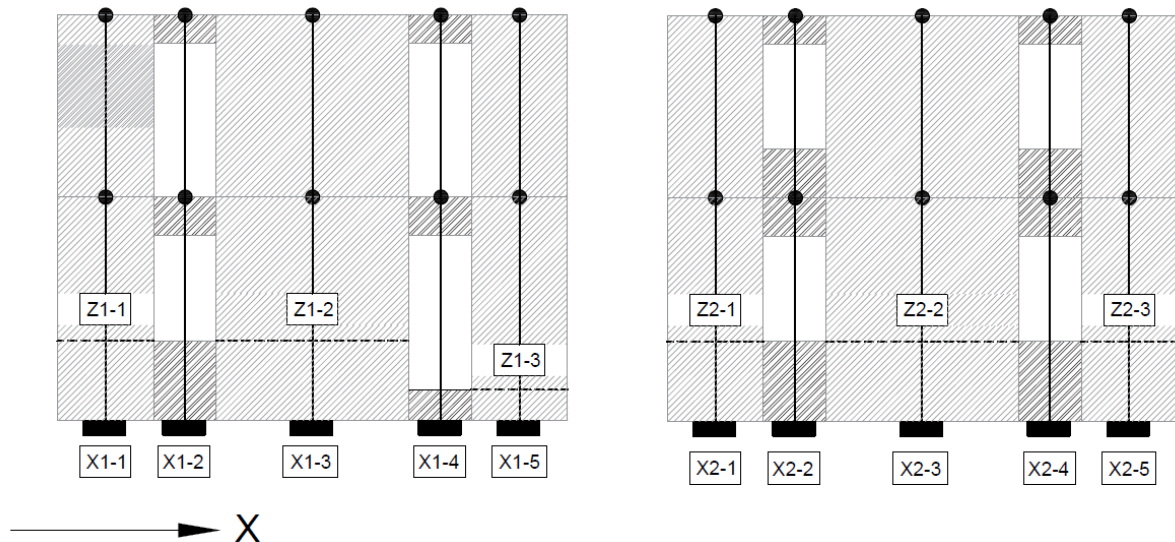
Piers arrangement for house PL along X axis: door wall (left); window wall (right)
